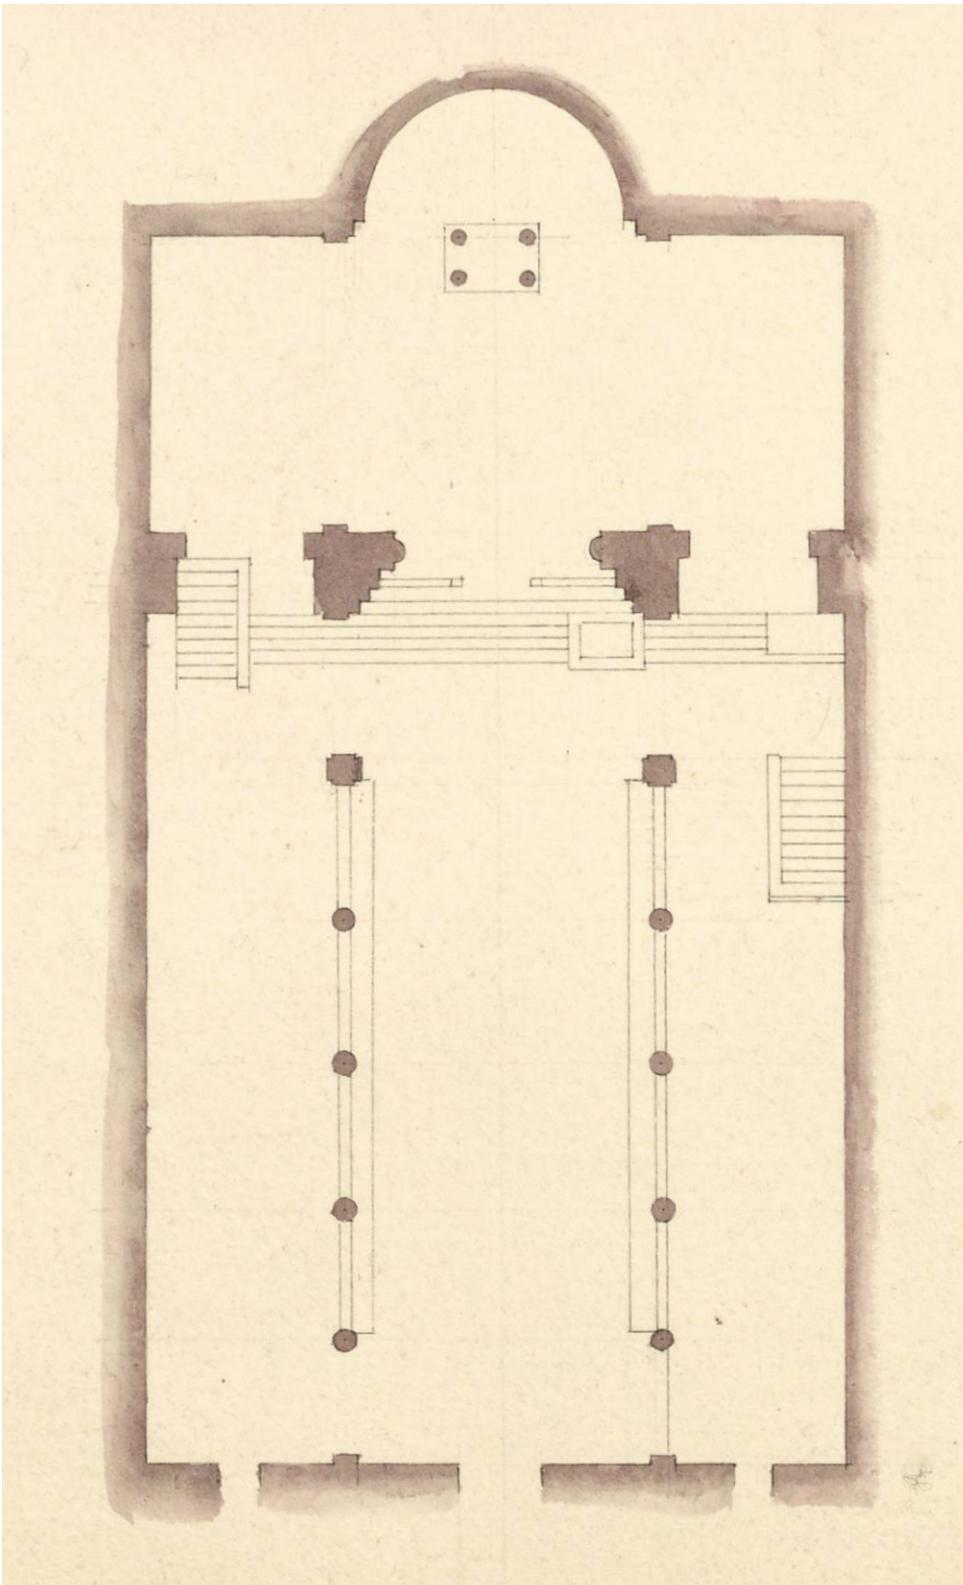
Plan of San Pietro in Tuscania (detail of fig. 1).
